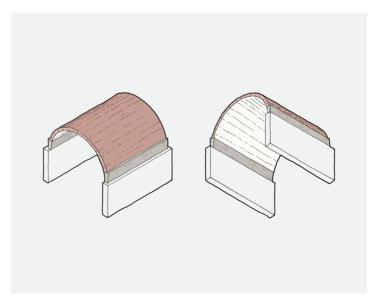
Ceiling as spatial definition: Masonry barrel vault
